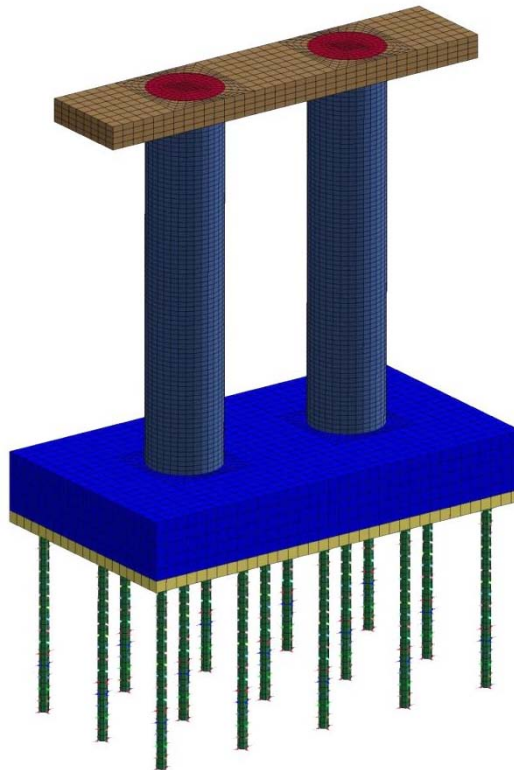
Double circular pier with cap beam, 8 m long pipe piles and soil springs
